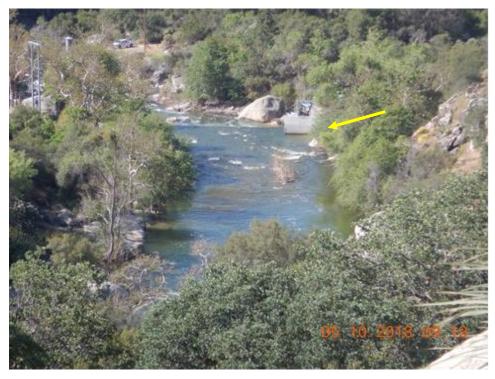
Kaweah No. 2 Diversion Dam and intake structure on the Kaweah River as seen from the Indian Head Trailhead Parking Area. Camera facing southwest. May 10, 2018.
